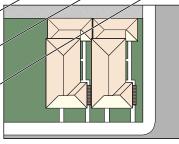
Tropical Urban Court, illustrative plan view
